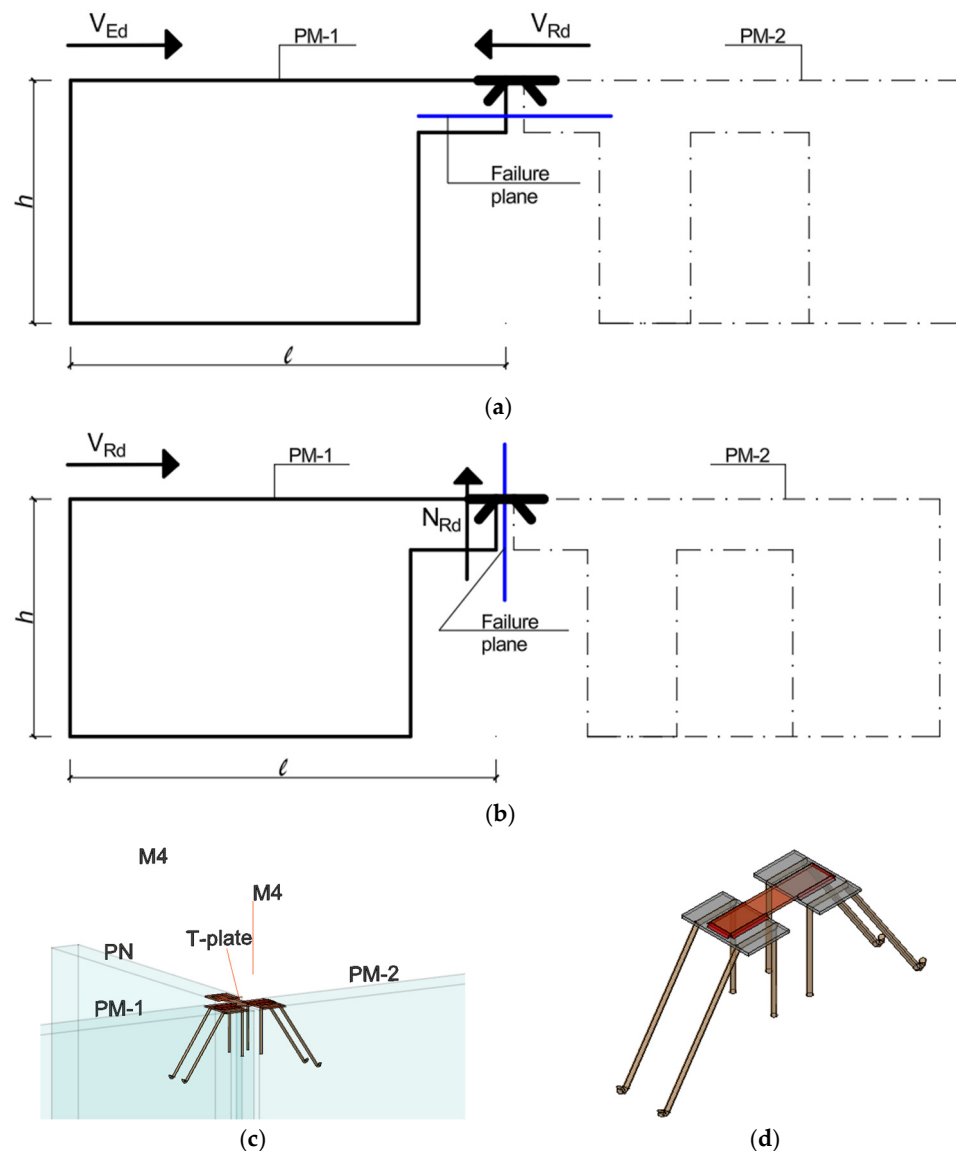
Joint D4: (a) horizontal failure plane; (b) vertical failure plane; (c) 3D view of joint D4 and the adjacent panels; (d) steel-plate connection for panels PM-1 and PM-2 (all dimensions in cm).
